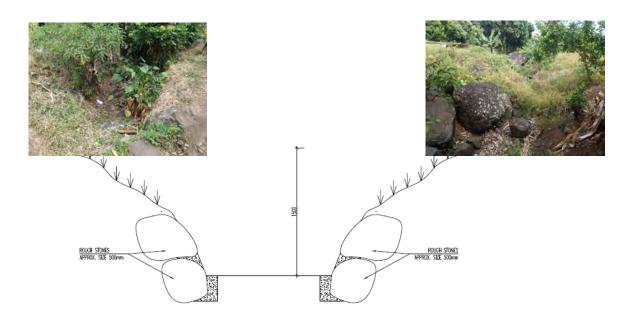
Typical Cross Section of Upgrade of Existing Water Course (source: JET)
